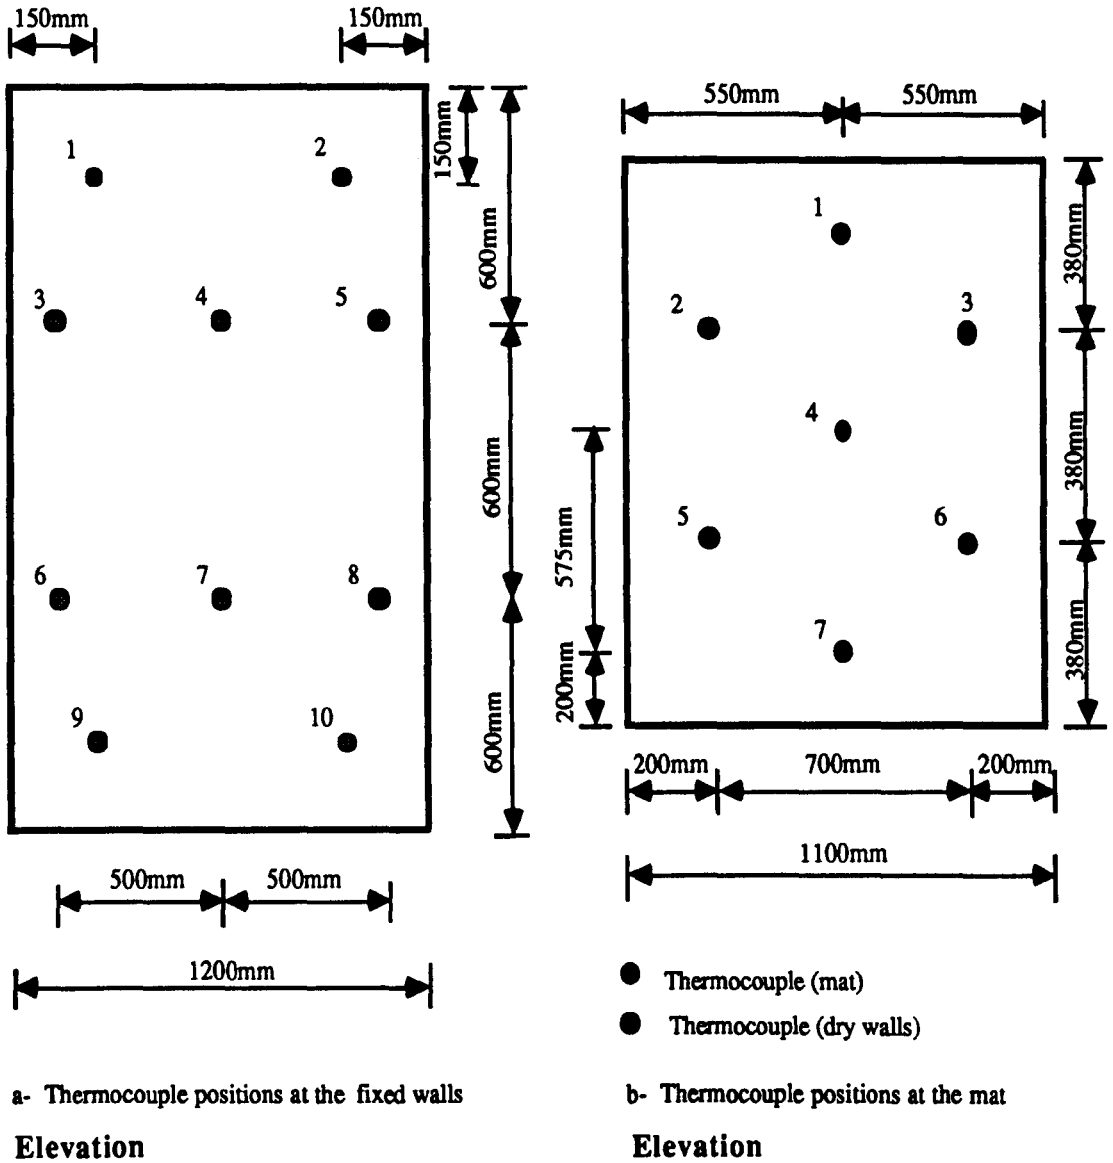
Thermocouples layout on the inner faces of the cavity and both sides of the mat.
